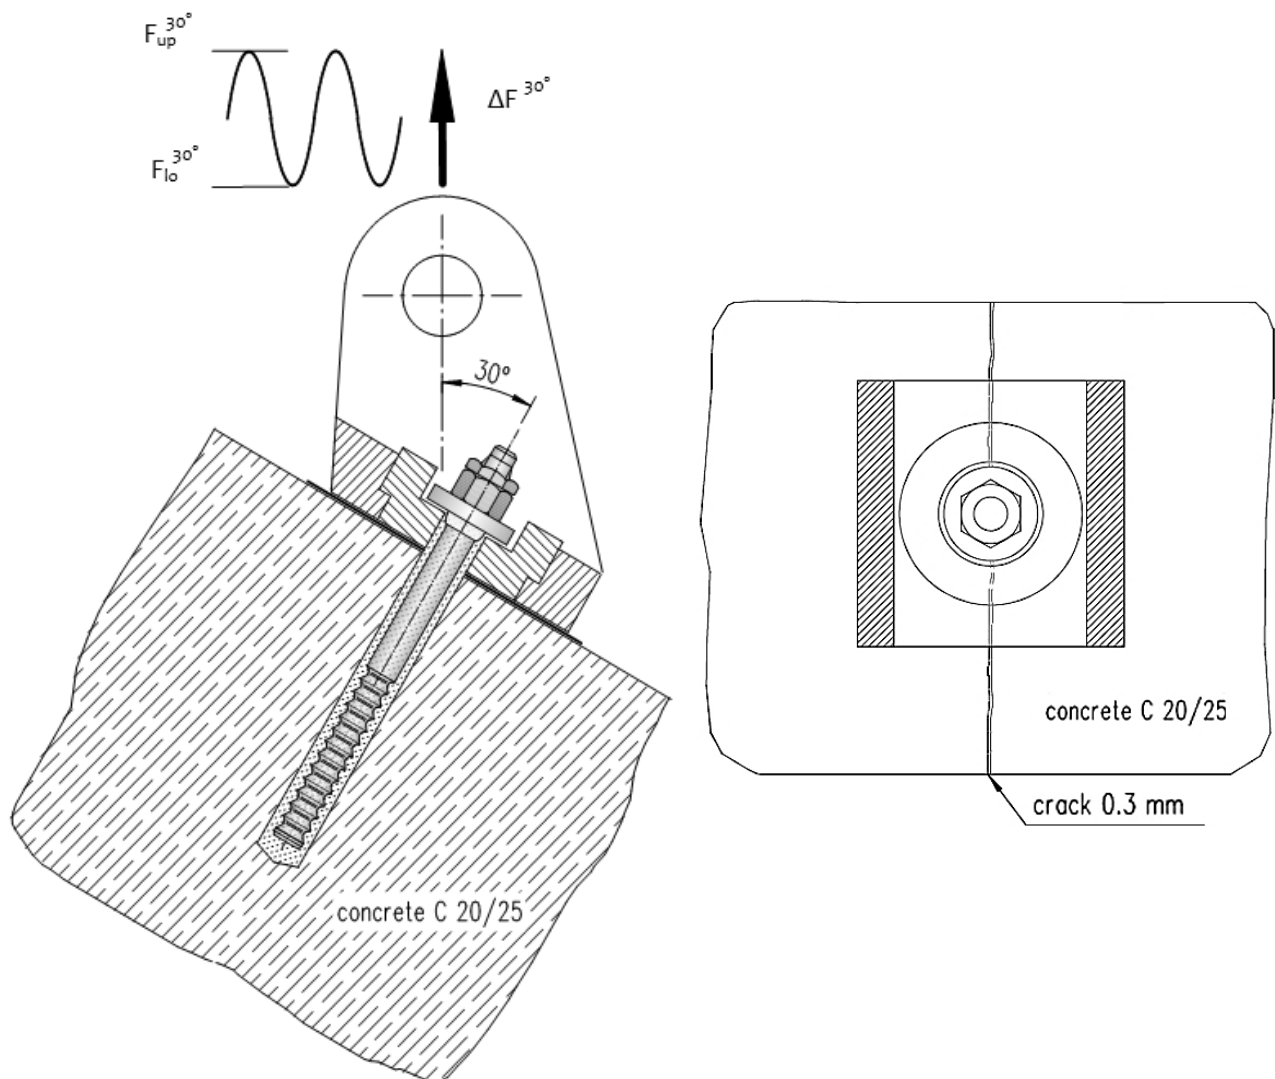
Example of test setup for steel failure under combined tension and shear in cracked concrete
